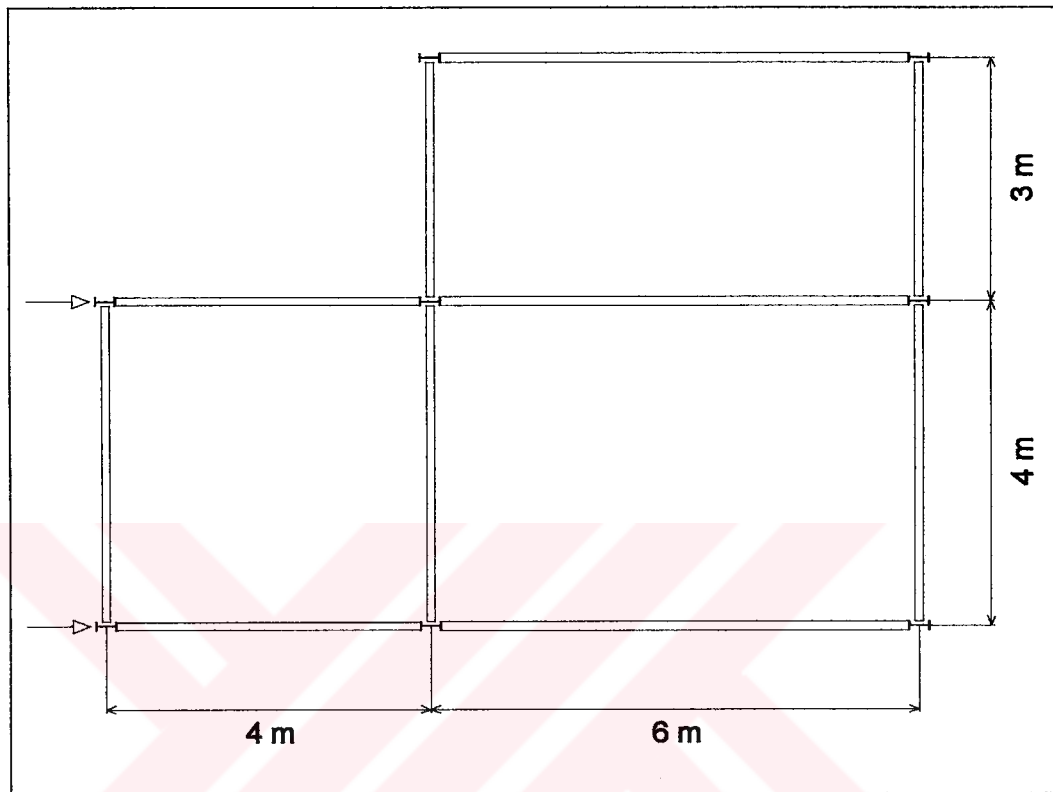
Typical Floor Plane of a Two-Story Steel Frame Structure
